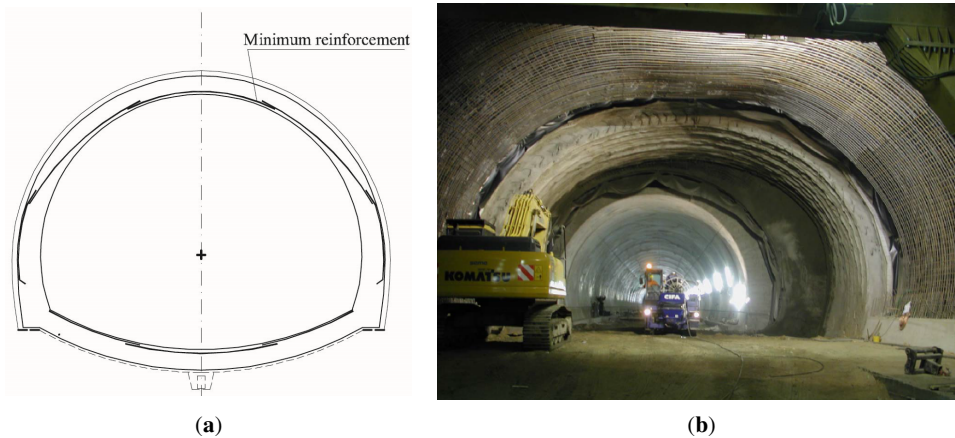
(a) The minimum reinforcement in a tunnel cross-section; (b) the position of steel rebar in tunnels.
